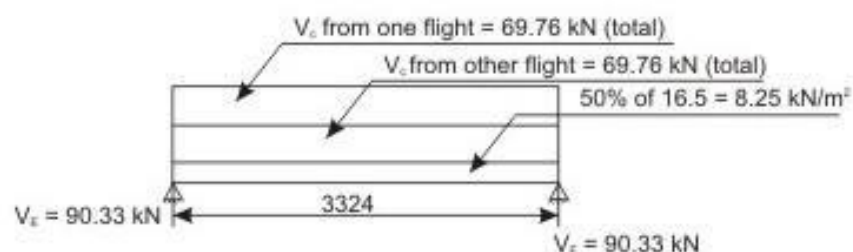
Calculation of loads, sec 2-2 of Example 9.1, (Fig. 9.20.10)
